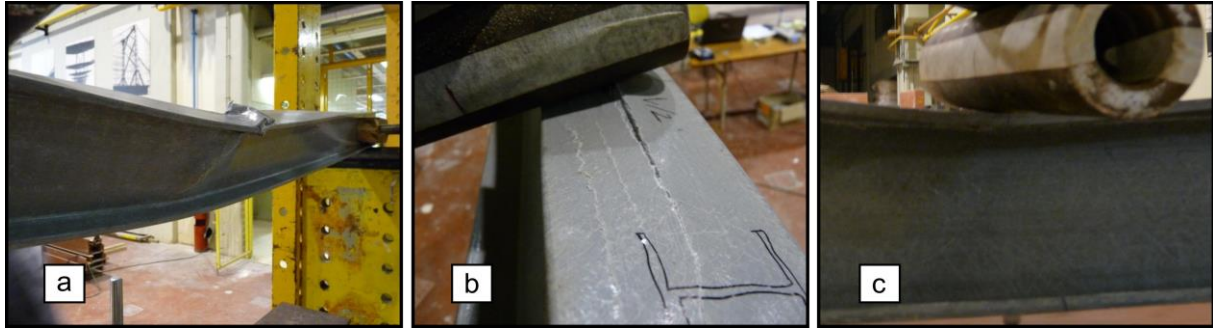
Failure modes: (a) I100 beams, (b) I150-V1/V2 beam, and (c) I150-V3 beam.
